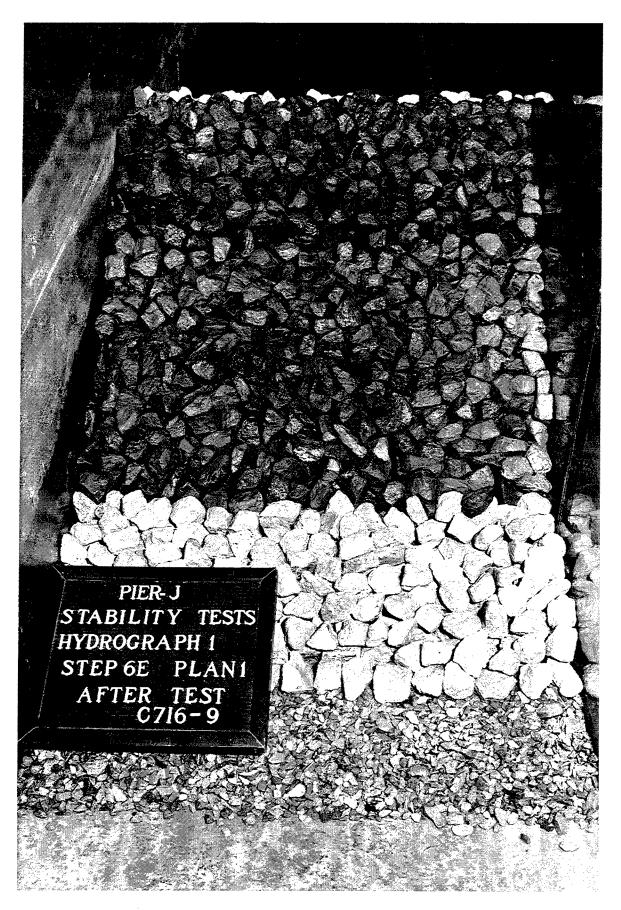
Sea-side view of Plan 1 after testing step 6 of Hydrograph 1
